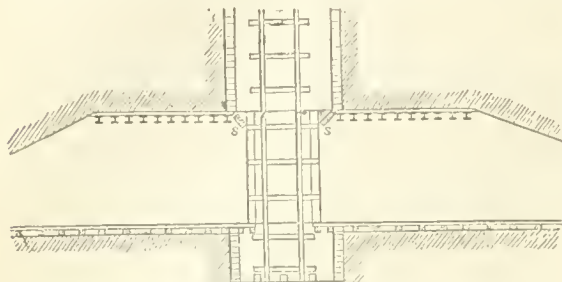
Pit eye, Cambois Colliery—Vertical Section.
